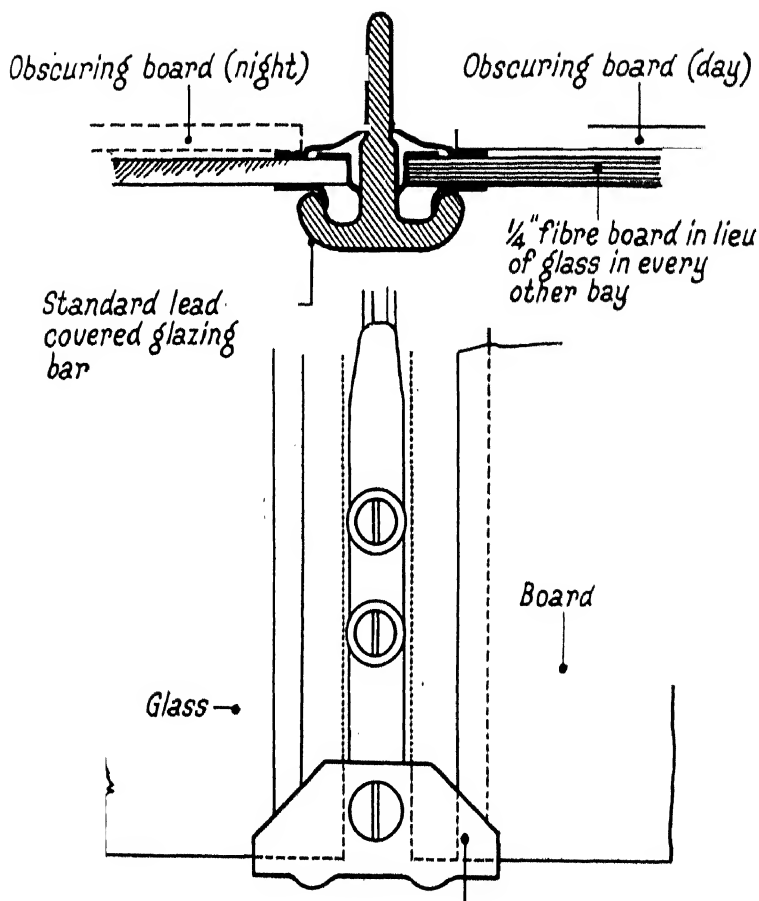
Sliding tray under roof lights providing light obscuration and protection against falling glass.
